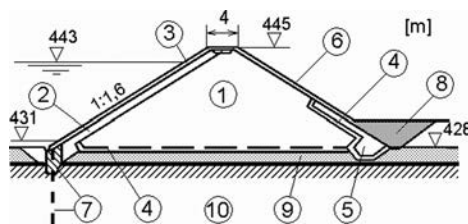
Skalka dam. (1) Rockfill; (2) compacted gravel – 95 cm and sand 5 cm; (3) prestressed concrete facing – 20 cm; (4) filter layer; (5) selected rockfill; (6) top soil; (7) concrete cutoff with grout curtain; (8) earth filling; (9) alluvial deposit; (10) rock foundation.
